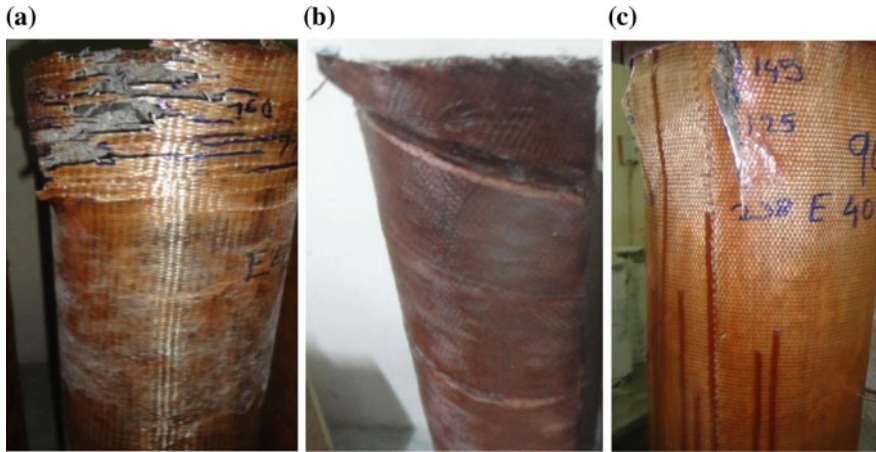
Failure pattern of wrapped specimen a 0° wrap, b 45° wrap, and c 90° wrap
